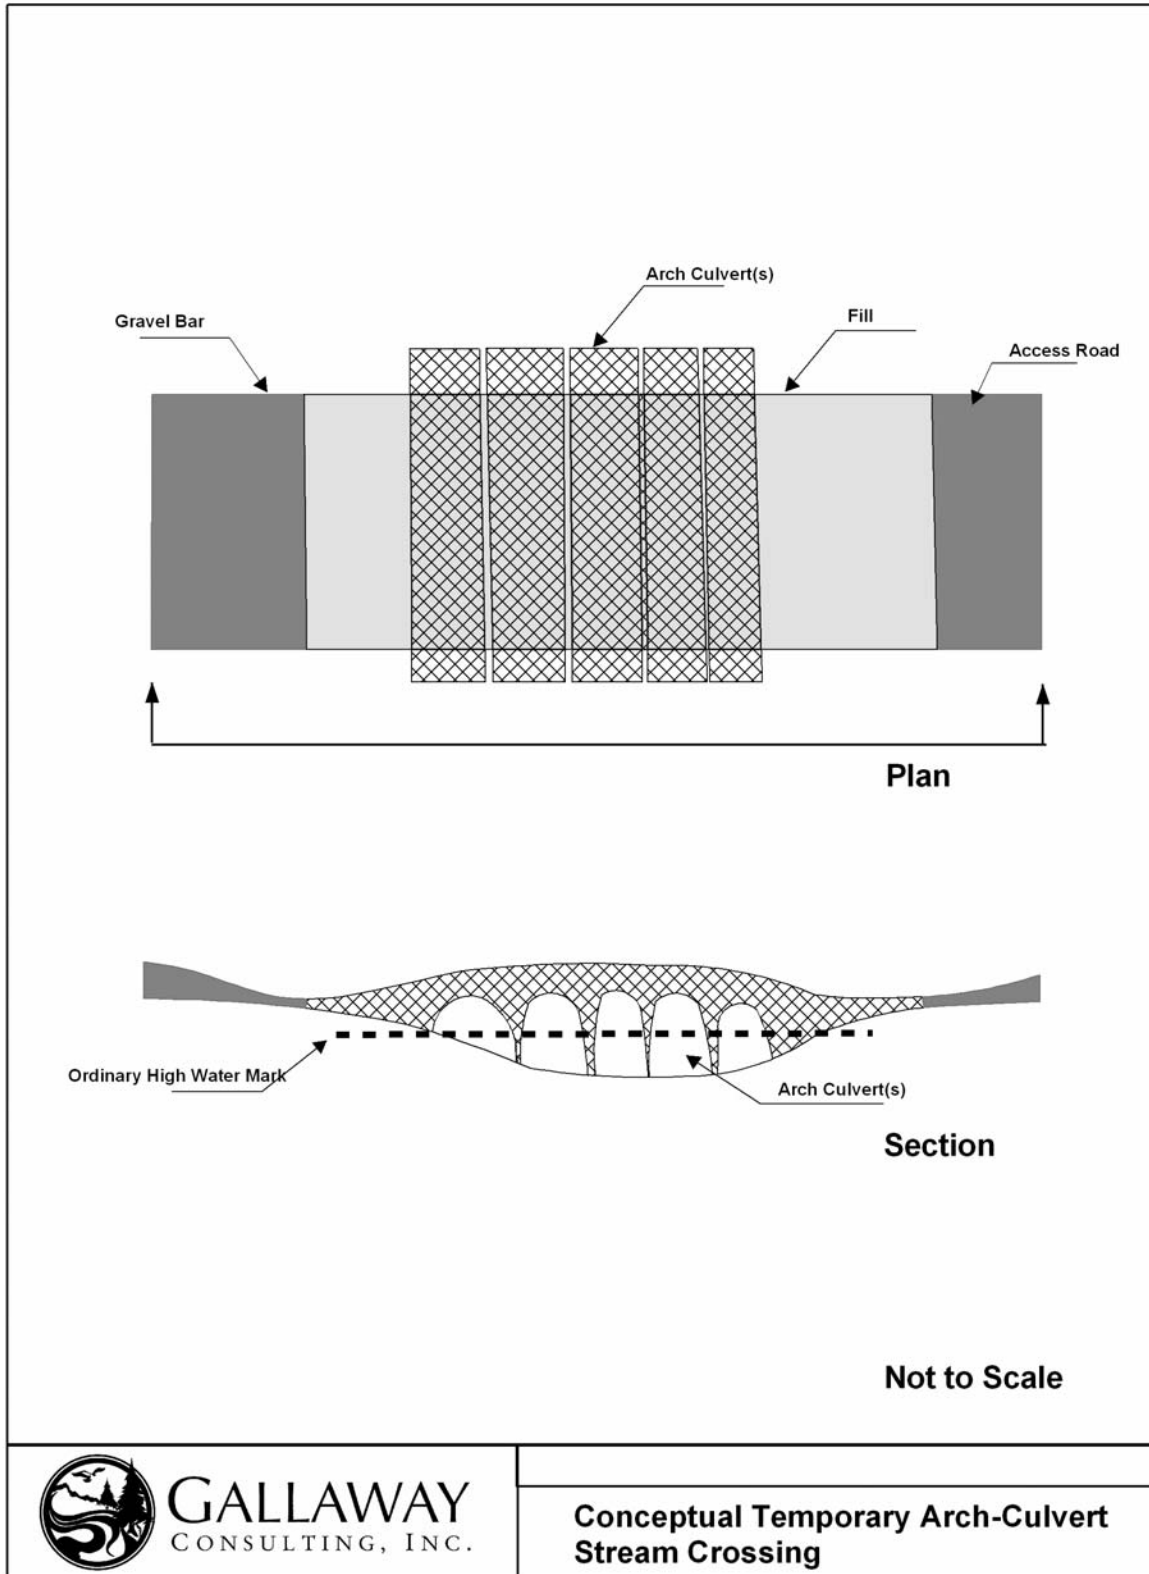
Big Chico Creek Culvert Crossing Concept
